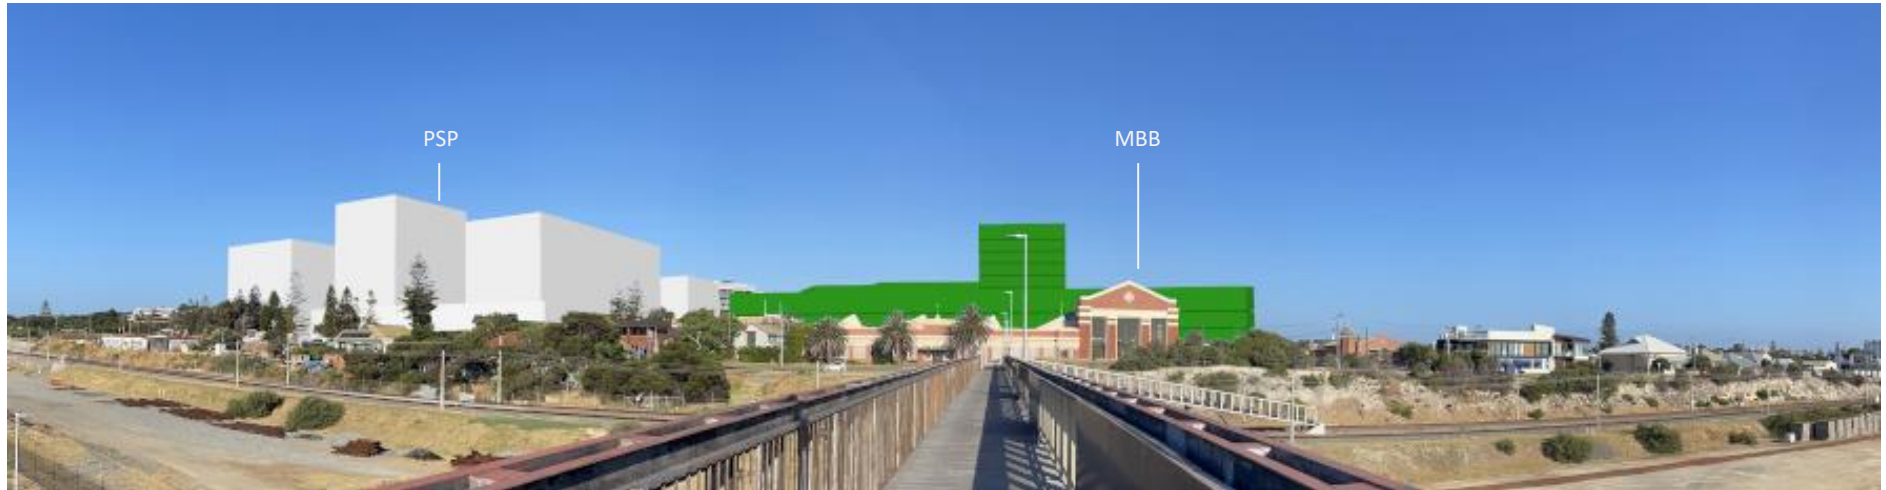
Viewpoint 19 - View on the pedestrian bridge leading to Stirling Highway
